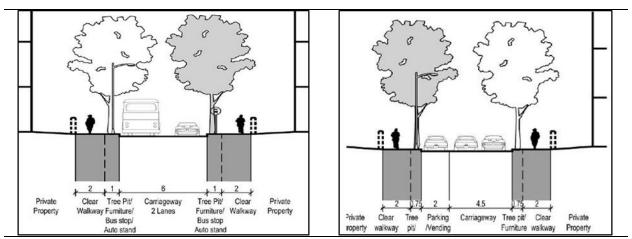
Street design with different combination for carriage way, footpath and plantation
